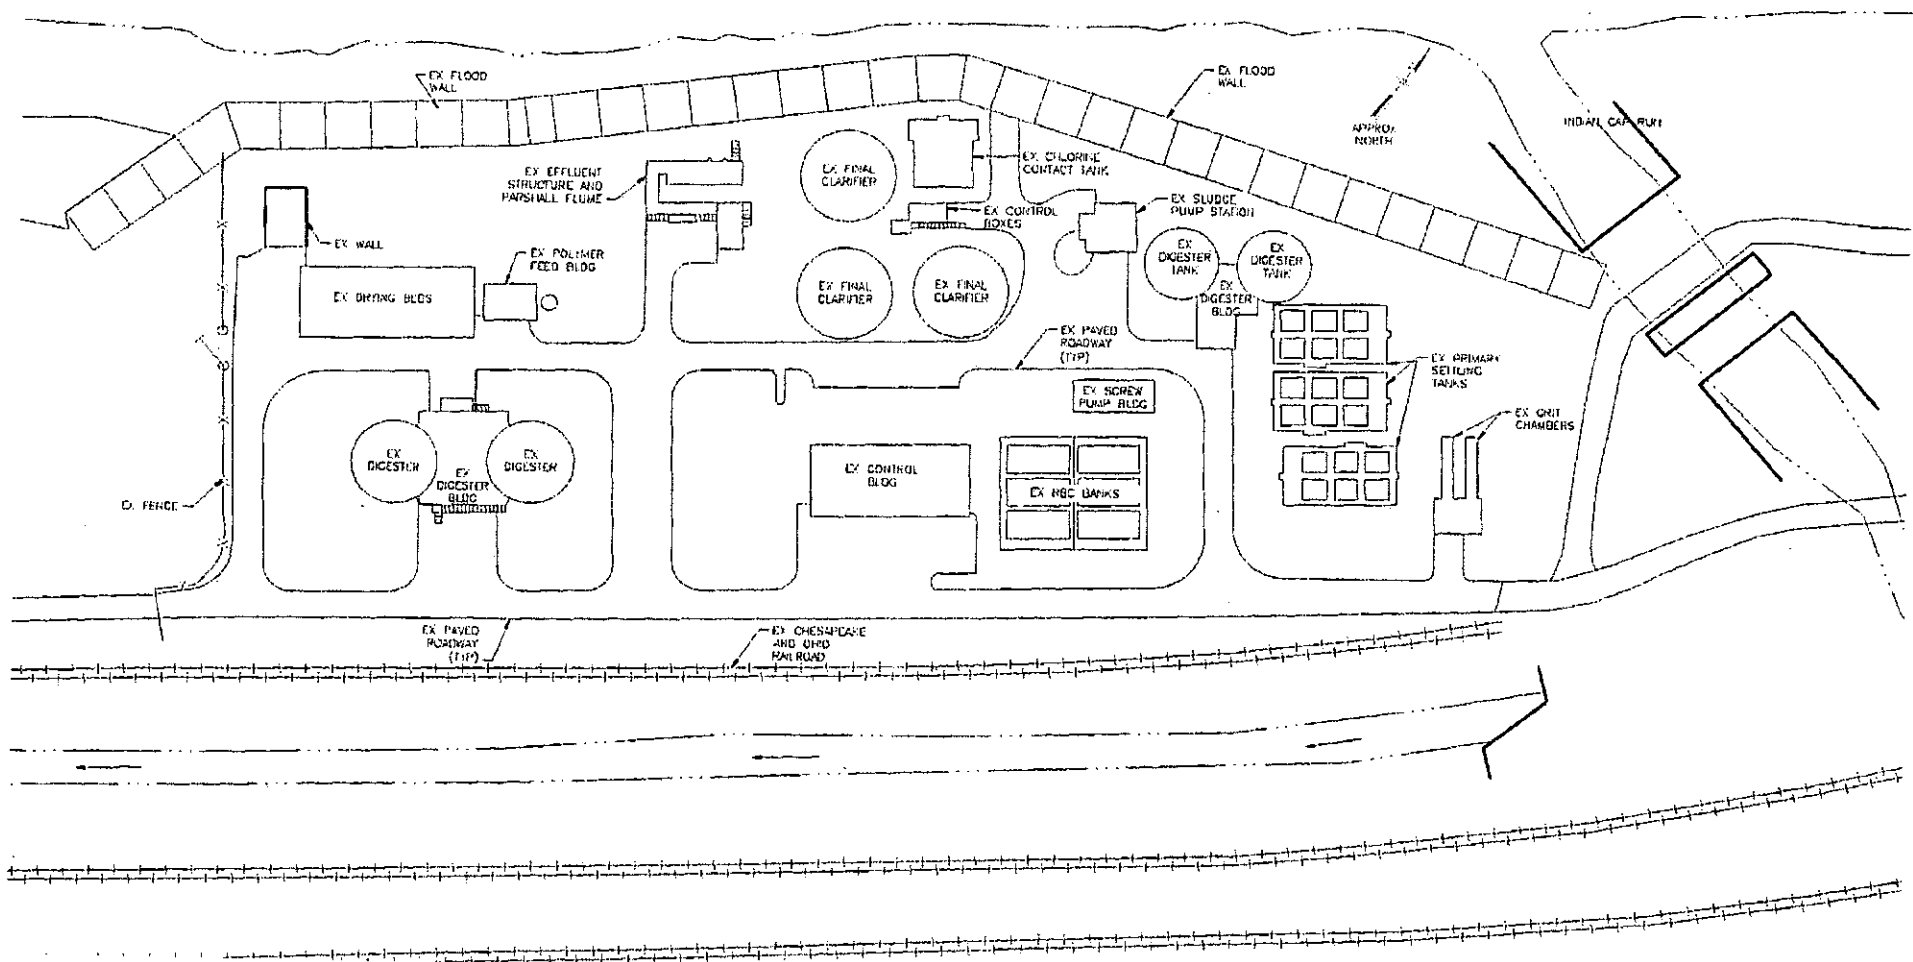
Buena Vista Wastewater Treatment Plant Site Plan
